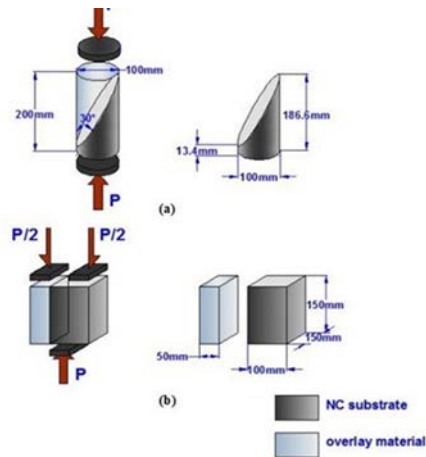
Dimensions of specimens for (a) Slant shear test (b) Bi-surface shear test.
